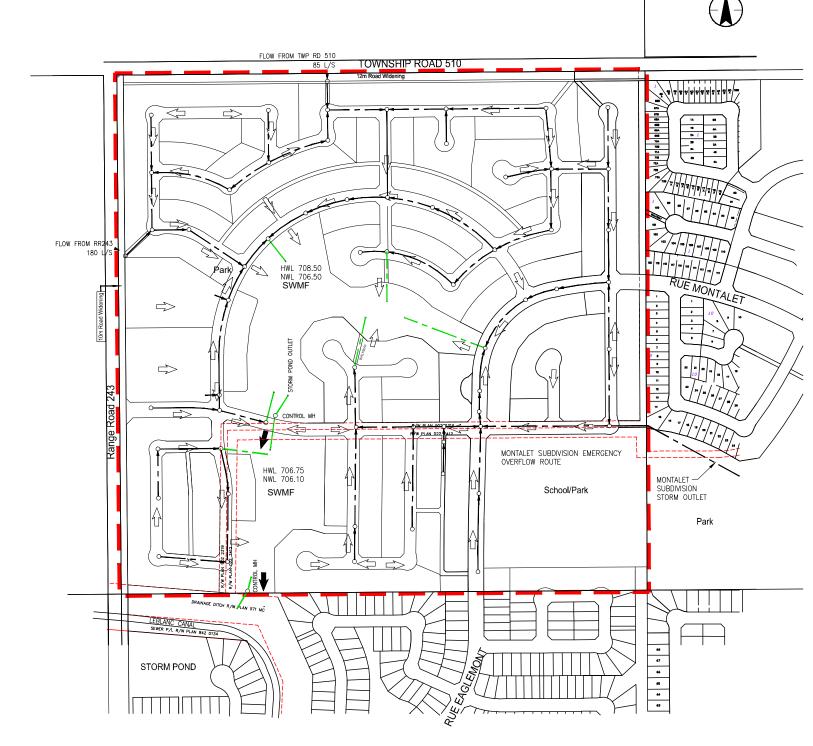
Stormwater Management, illustrates the proposed stormwater system that is comprised of the following components:
